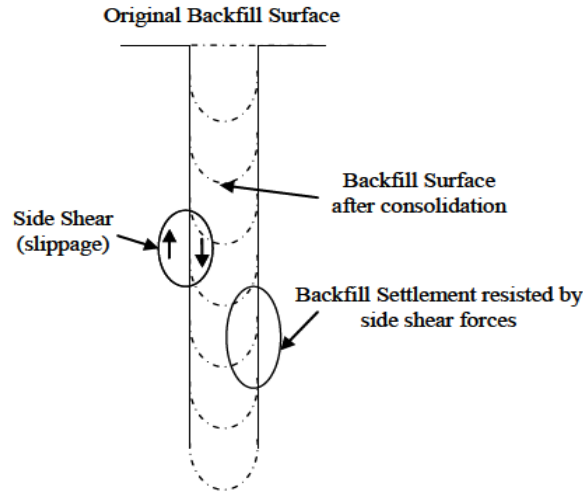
Schematic of load transfer of SB backfill to trench sidewalls (from Ruffing 2009).
